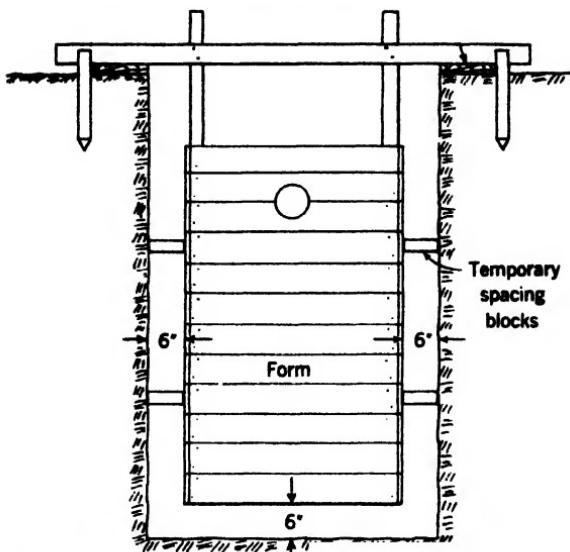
The inside form suspended in the pit ready for pouring the floor and walls of the tank. The temporary spacing block will keep the form from drifting with pressure of the concrete. The blocks should be removed as the concrete builds up to them.
